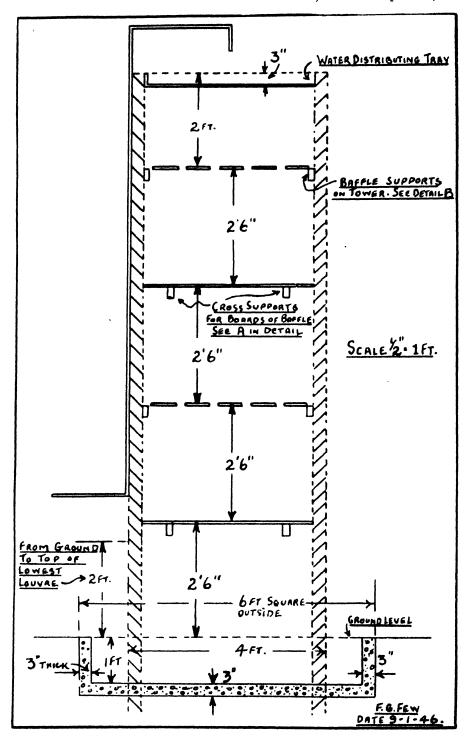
Sectional elevation showing number and desposition of baffles and concrete pit.
